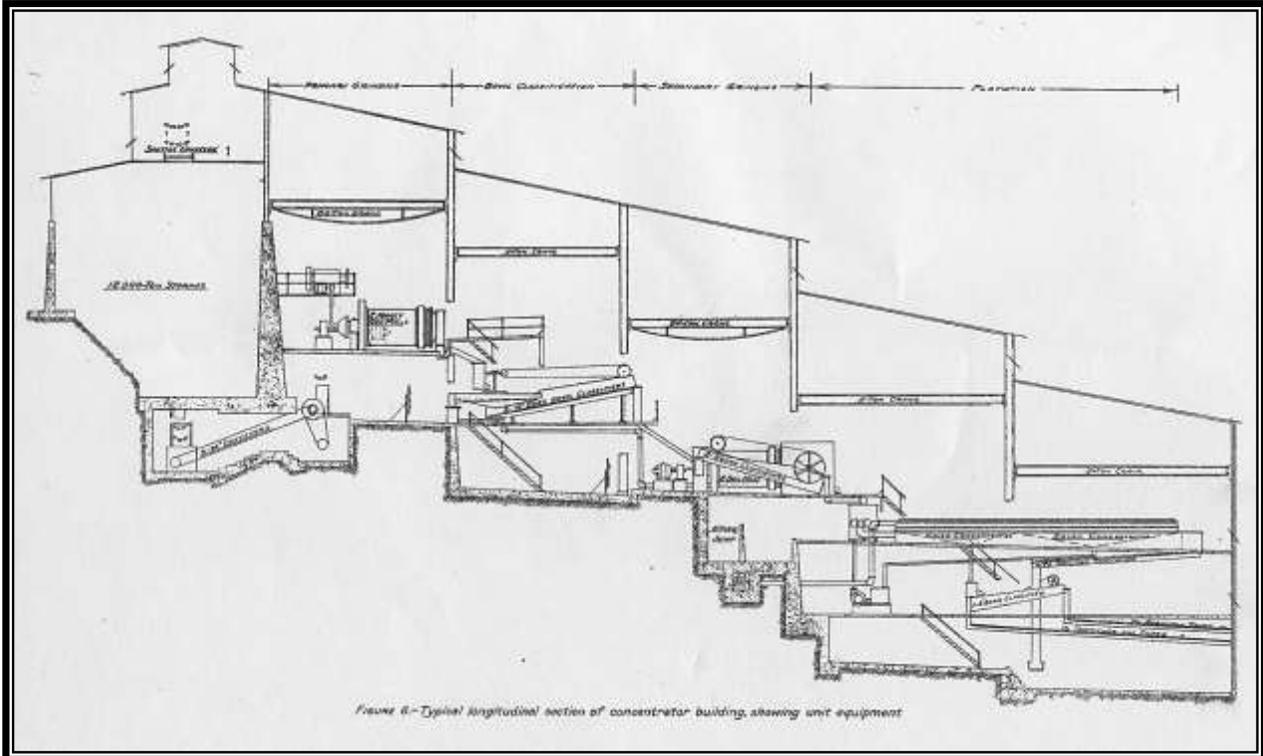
Typical longitudinal section of concentrator building, showing unit equipment
